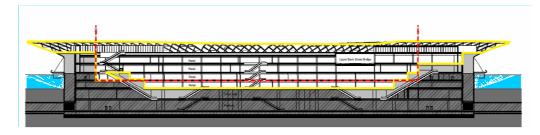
Section of the approved Crossrail Station with proposed Overstation Development Scheme
